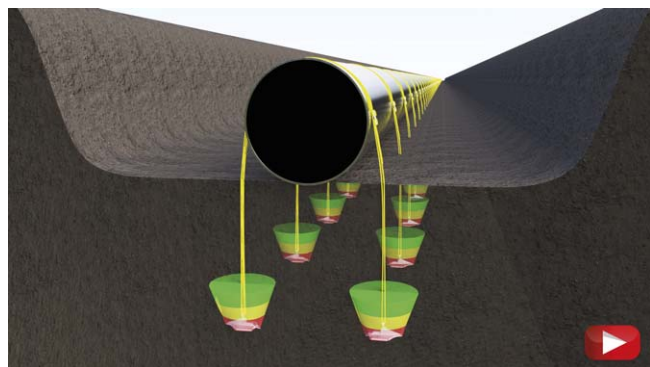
Installation guide of a typical Platipus pipeline anchoring system.
